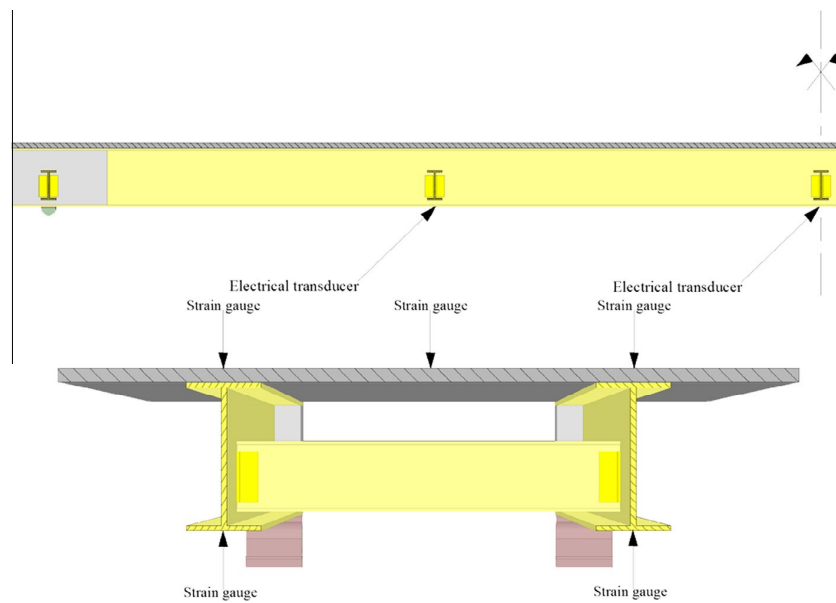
Cross-section of the footbridge: Longitudinal cross-section, with the electrical transducers (above). Transversal cross-section, at mid-span, with the strain gauges sensors (below).
